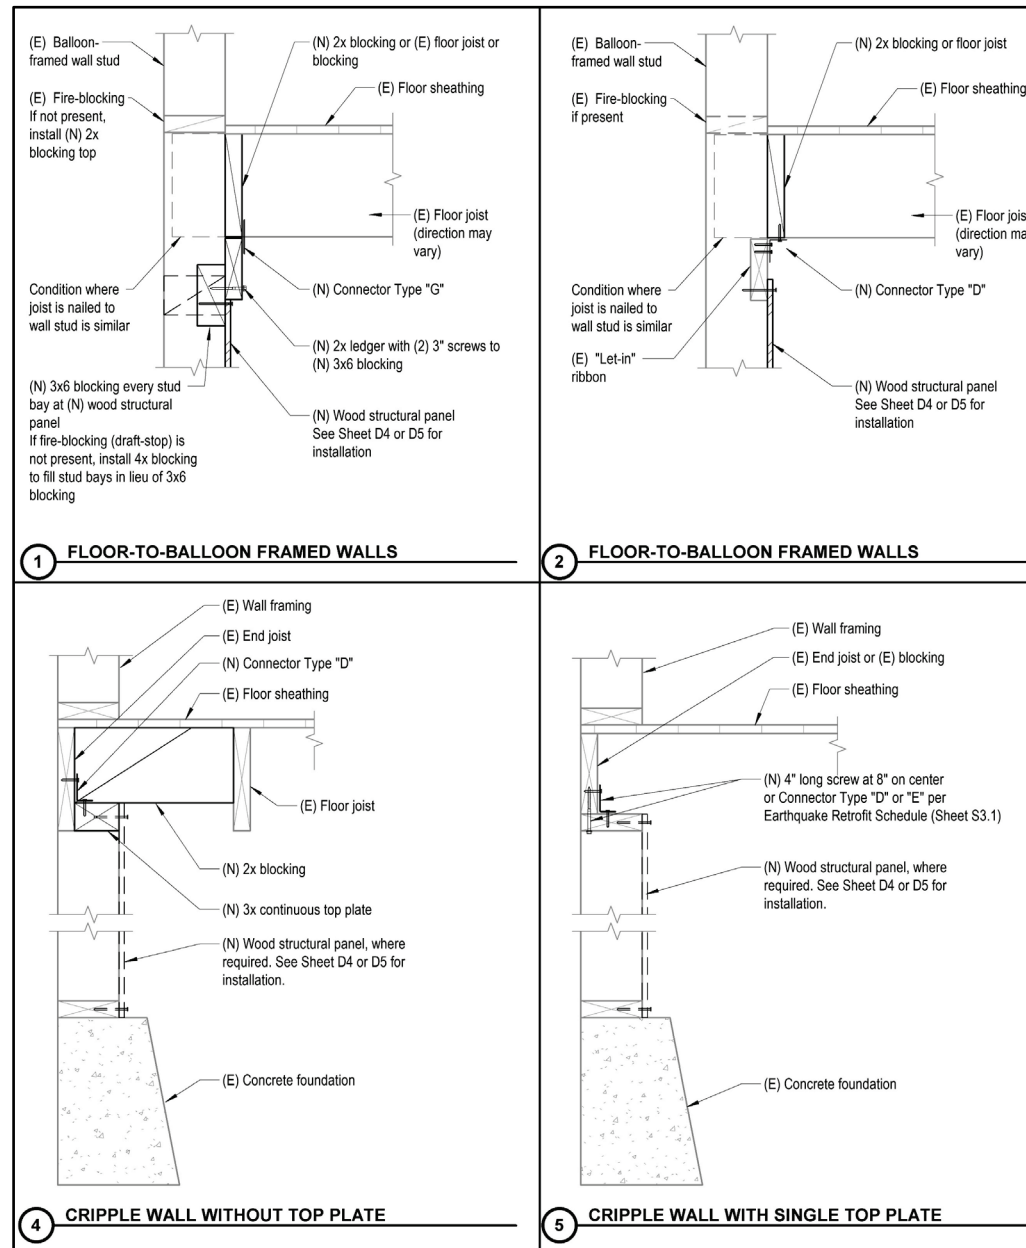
Floor framing to cripple wall connection details. Sheet D3.1.
